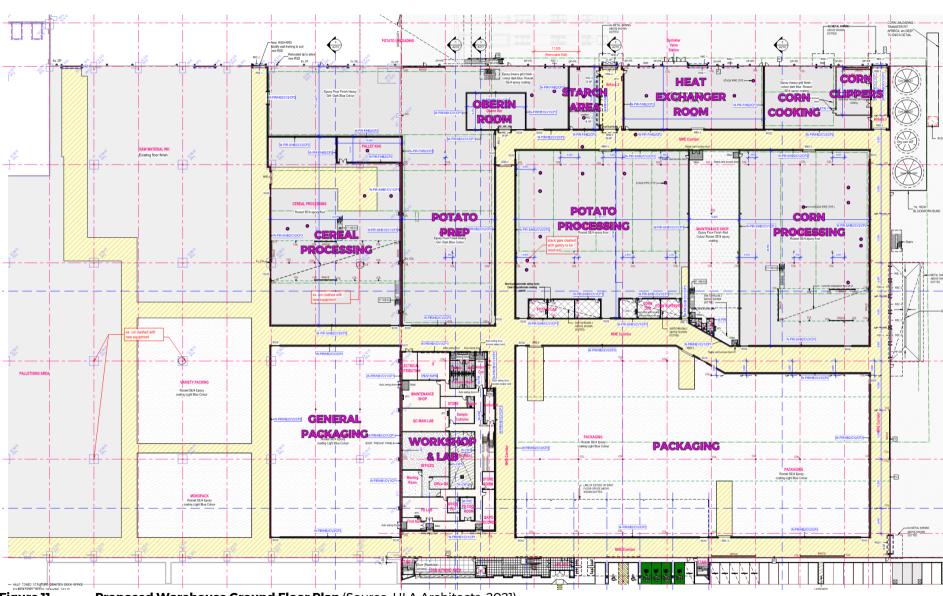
Proposed Warehouse Ground Floor Plan (Source: HLA Architects, 2021)
